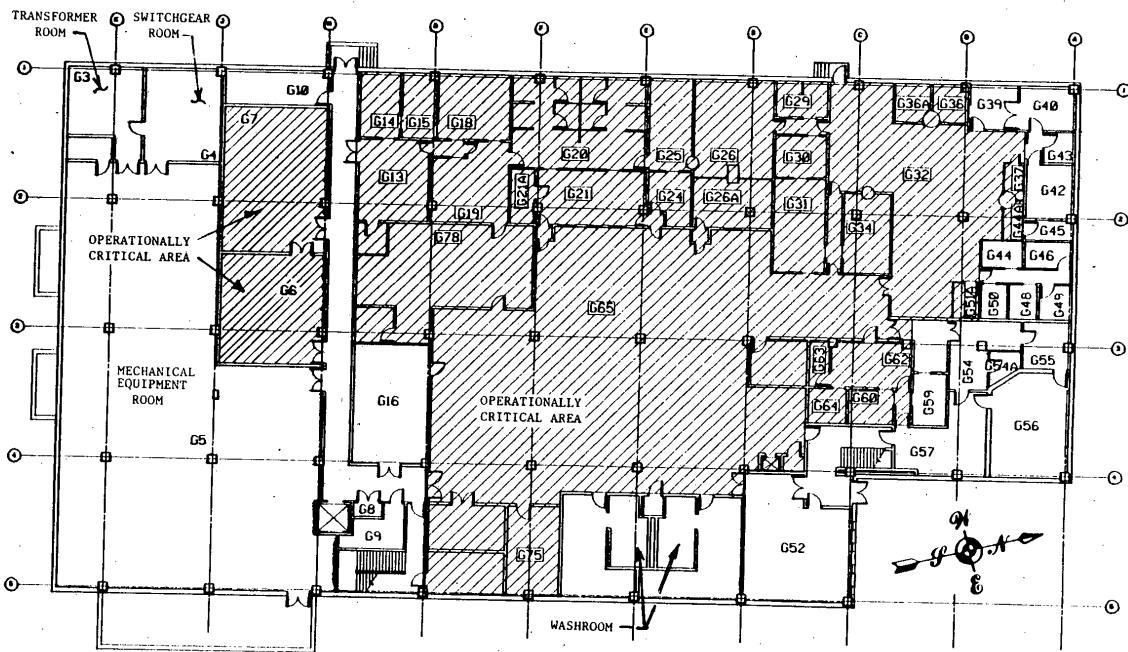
GROUND FLOOR ARCHITECTURAL LAYOUT
